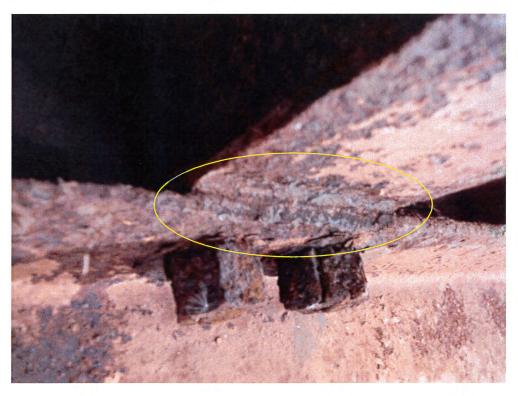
Section Loss to Bottom Flange of S5 at North Pier Cap
